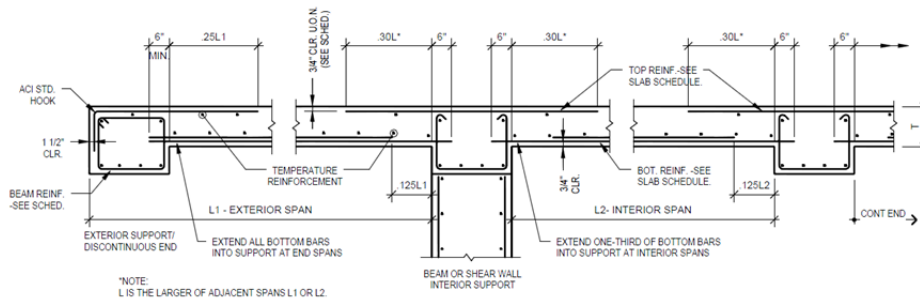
TYPICAL ONE WAY SLAB SHOWING REINFORCEMENT PLACEMENTS
